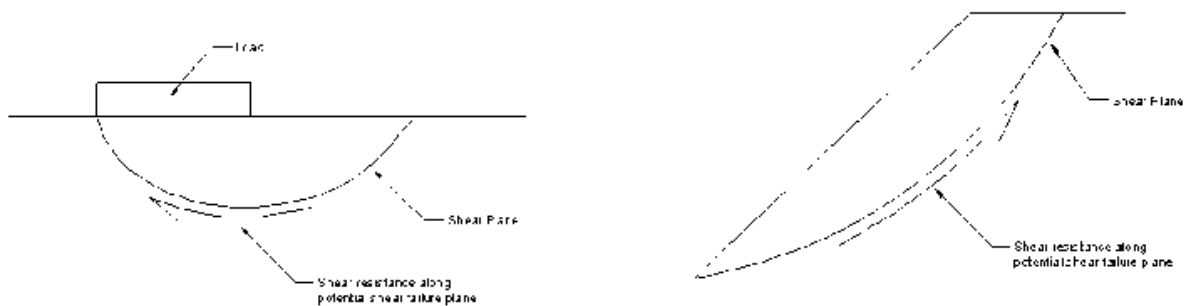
Soil Shear Failure – Potential Failure Planes
